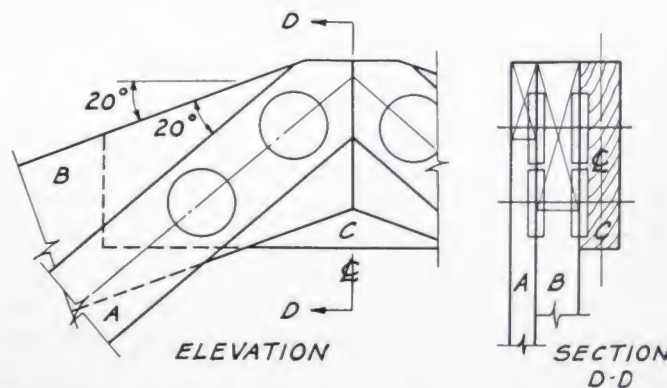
A Three Member Joint with Each Two Contacting Members Forming an Angle of Load to Grain Less than 30°
